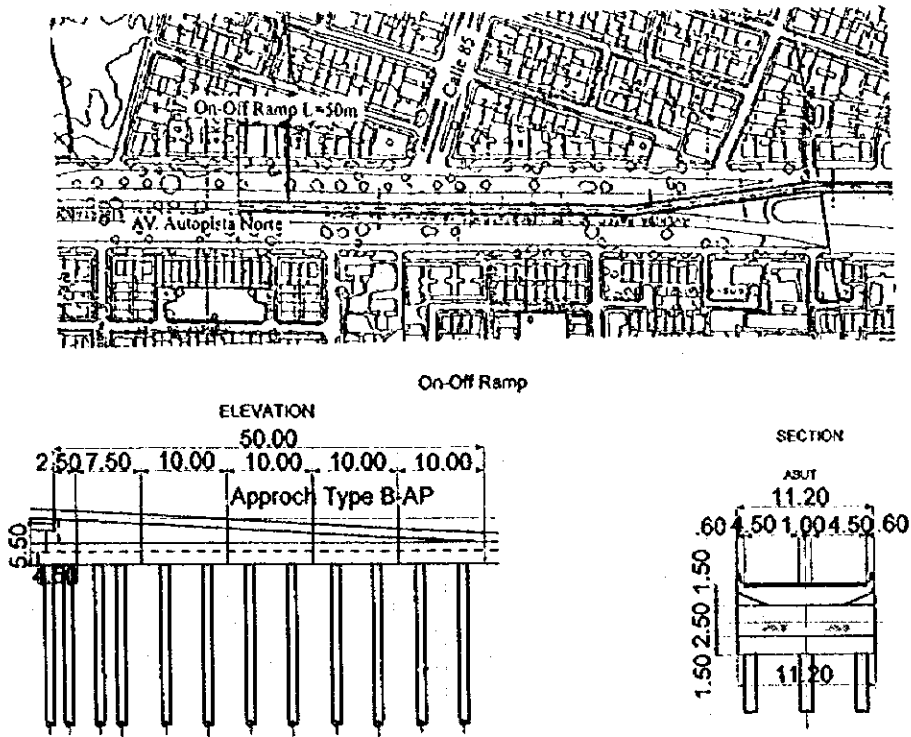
On-Off Ramp on Autopista Norte-Calle 86
